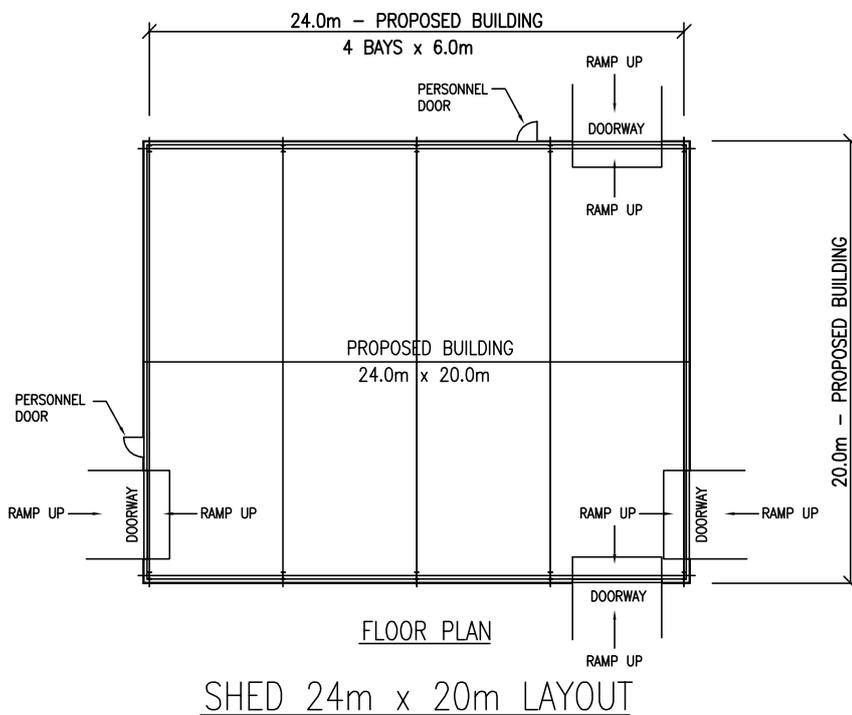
Class 10 buildings have a floor area of less than 500 m²
